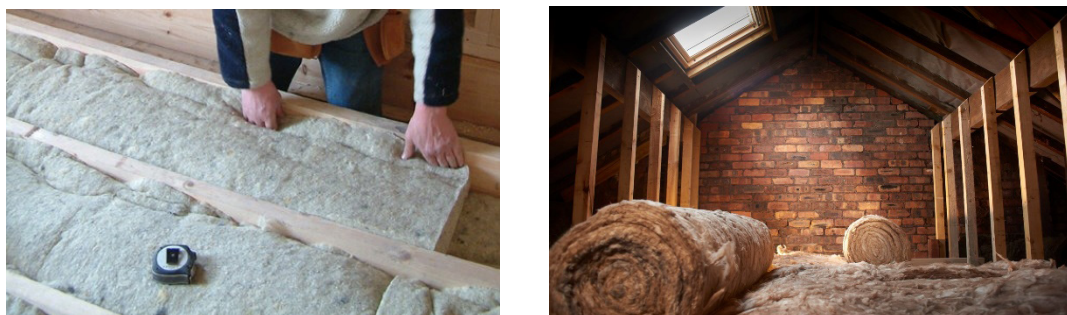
Laying insulation on the ceiling (Ovo, 2020)
